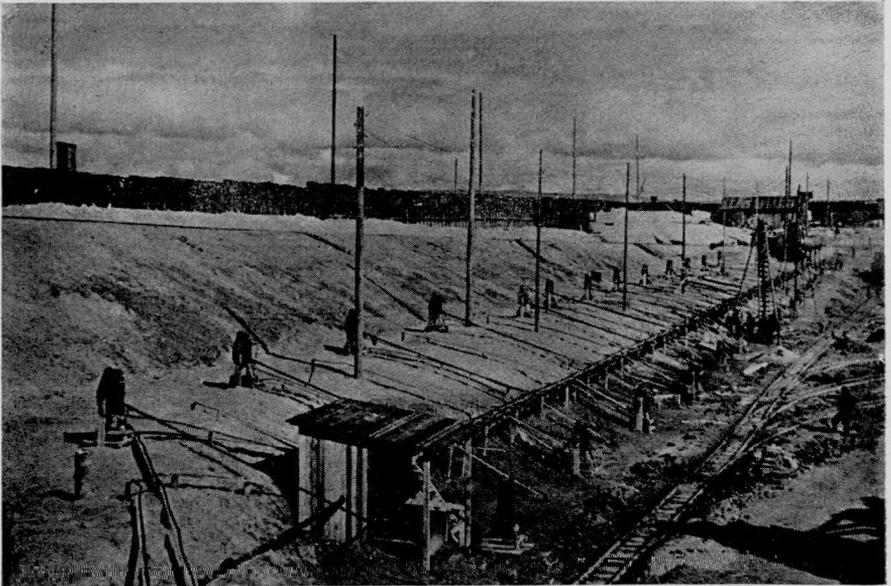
VIEW SHOWING PART OF INSTALLATION FOR ELECTRO-OSMOTIC STABILIZATION OF EXCAVATION FOR U-BOAT PEN IN NORWAY.
